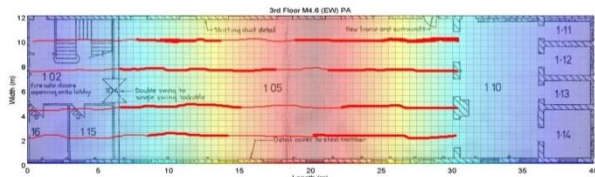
Acceleration profile of floor diaphragm in Building G which correlates to observed damage. Red lines represent floor cracking that developed during the Cook Strait earthquake sequence.
